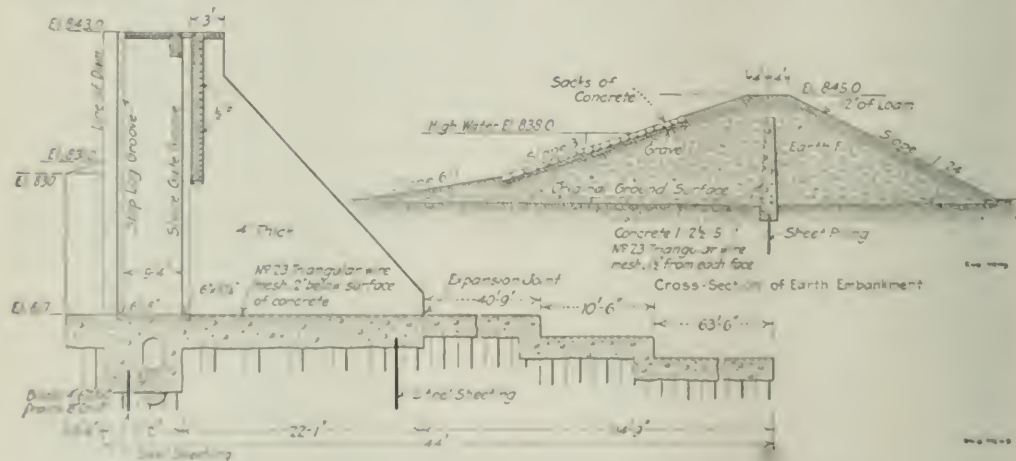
CROSS-SECTION THROUGH SLUICES AND THROUGH EARTH EMBANKMENT
